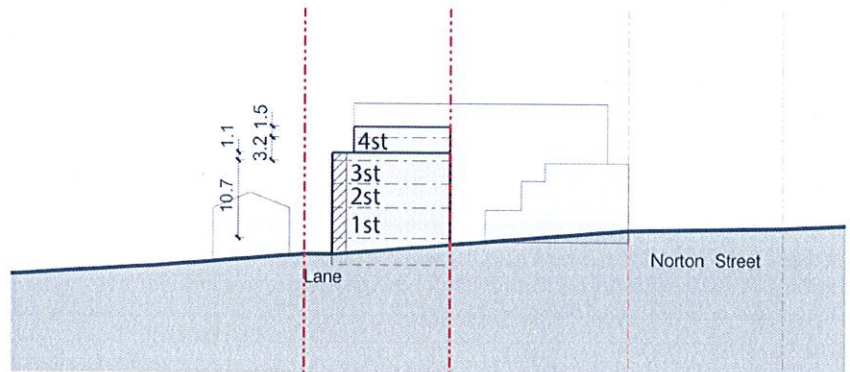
Carlisle Street _ Building envelope _ Street Elevation A-A
